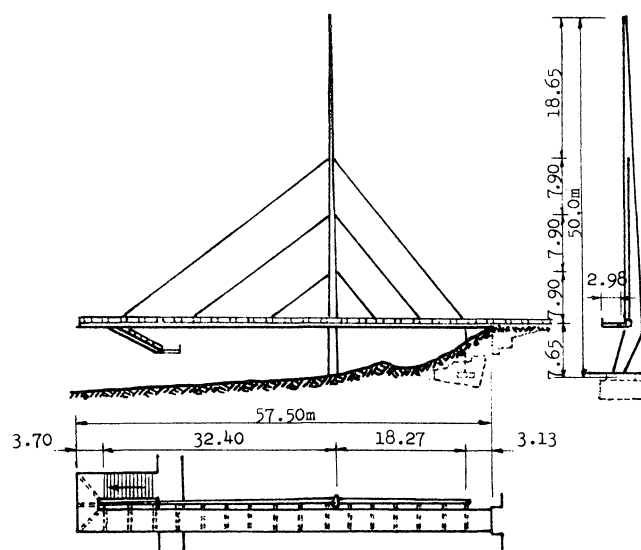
Footbridge, German Pavilion, Brussels, 1958 (Courtesy of The British Constructional Steelwork Association, Ltd.)
